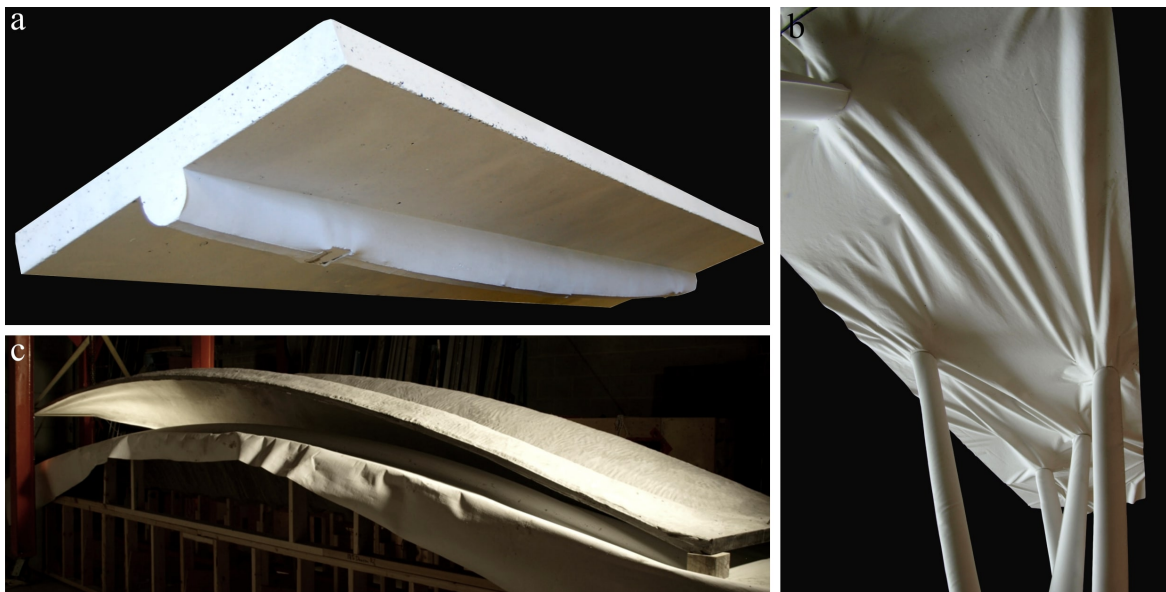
Examples of flexibly-formed concrete floor structures, including a) a T-beam with variable cross-section (image courtesy of John Orr), b) a floor slab with ribbed capitals and c) a pre-cast thin-shell flooring unit with stiffening rib (images courtesy of Mark West).
